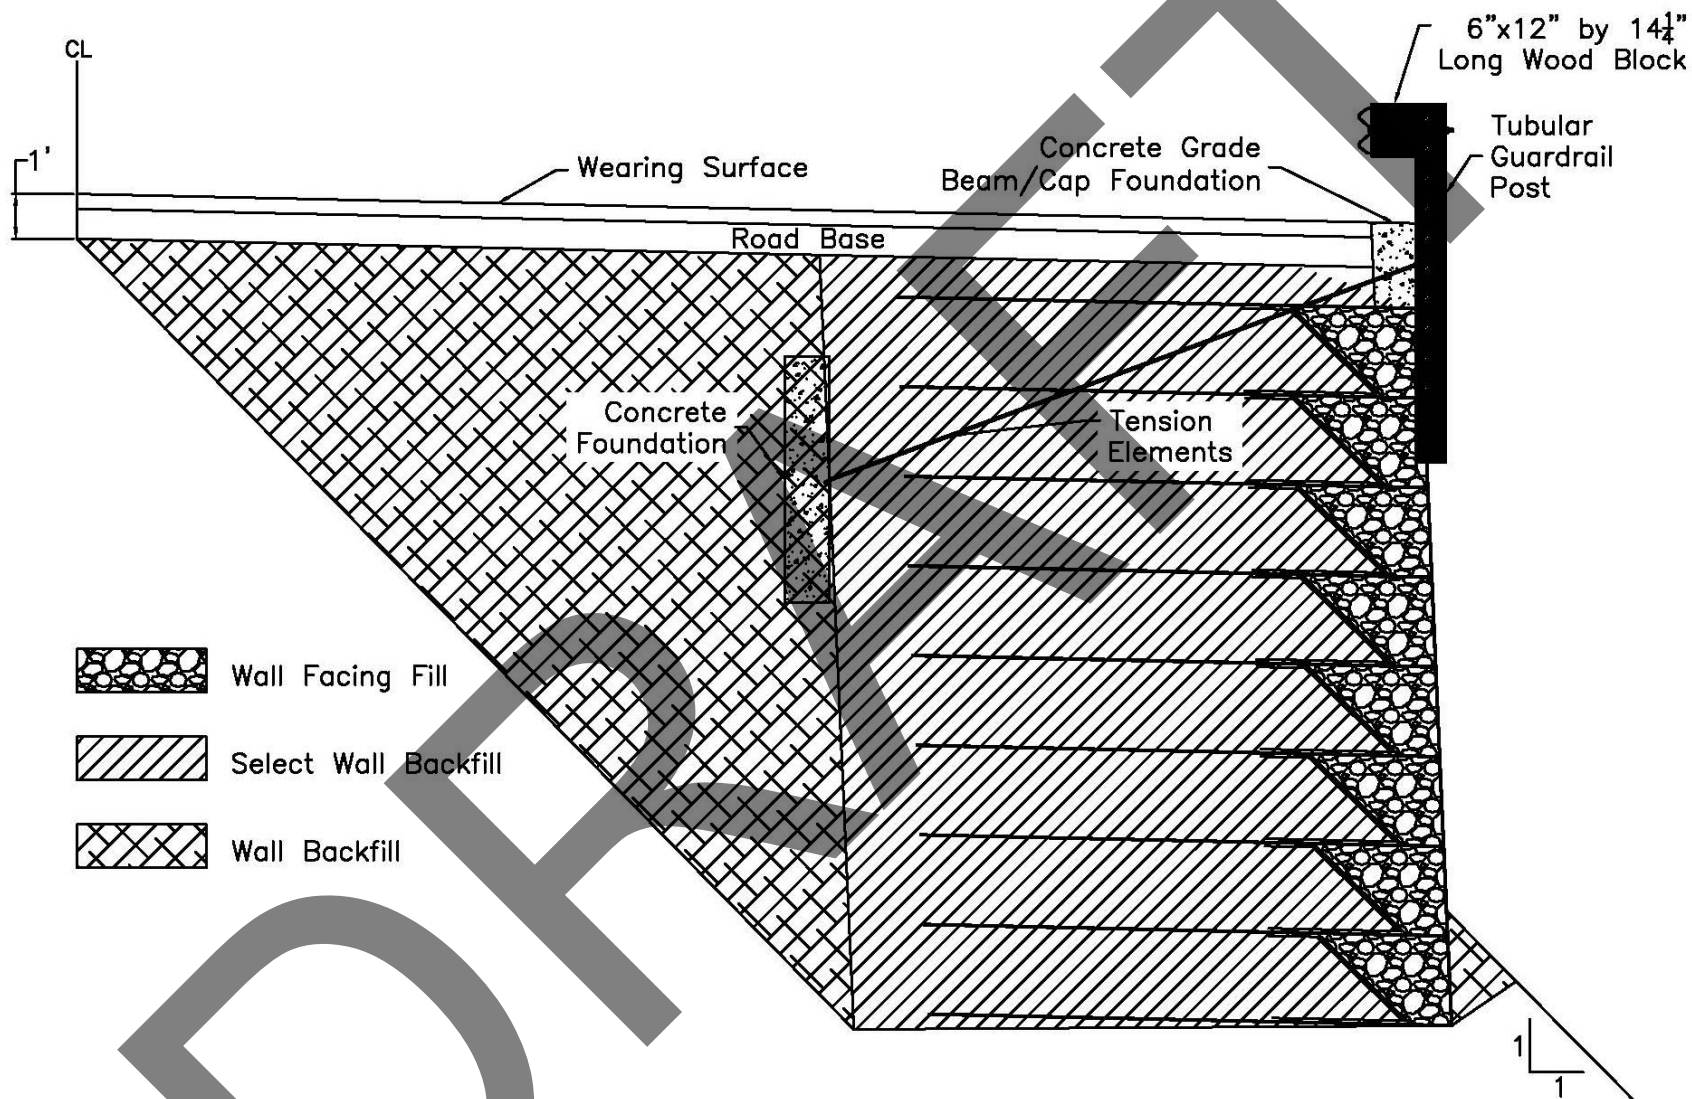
Schematic. MGS System with Tubular Post, Concrete Foundations, and Tension Elements.
